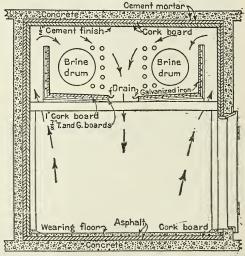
Typical cold-storage room with double overhead bunker and brine drums
